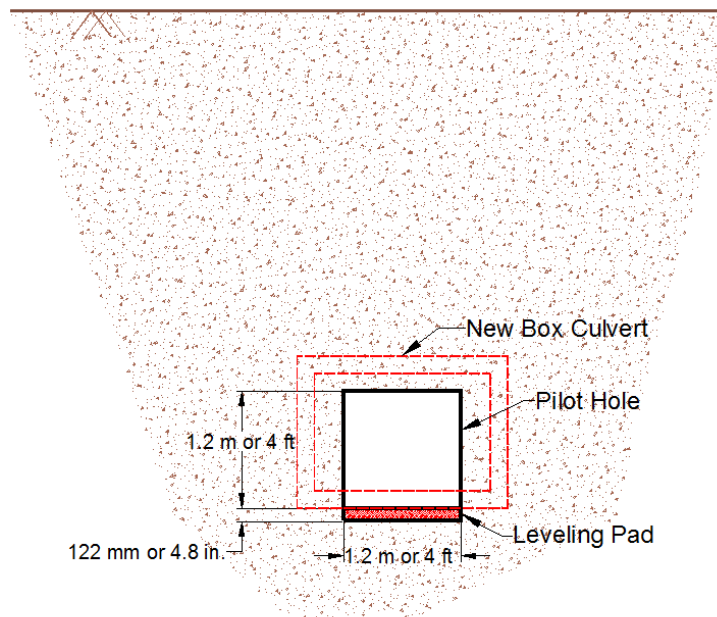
Pilot Hole and Leveling Pad for New Box Culverts
